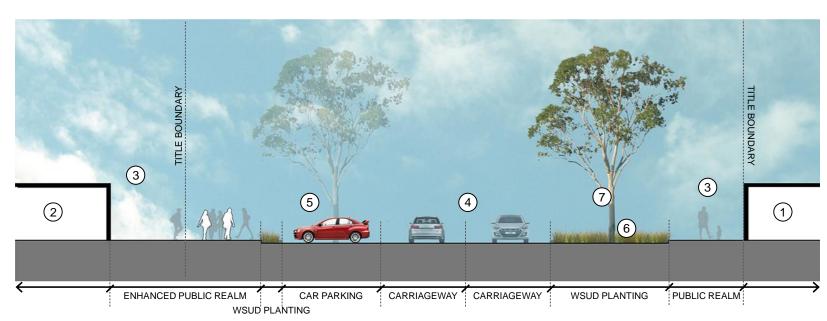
Kinglake proposed streetscape section (DD)
